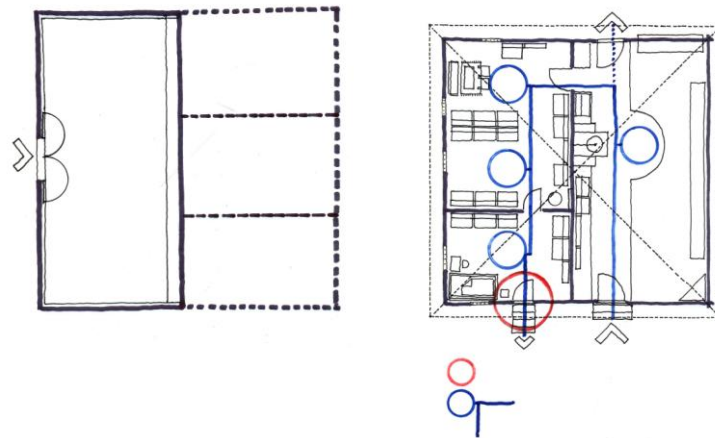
a) The basement plan with the ground floor foundations, b) The ground floor plan with the blue line showing the movement of visitors and the place where a new door was installed (red circle) for uninterrupted walking and looking around the exhibition (drawings by architecture professor Aleksandar Radojević)
